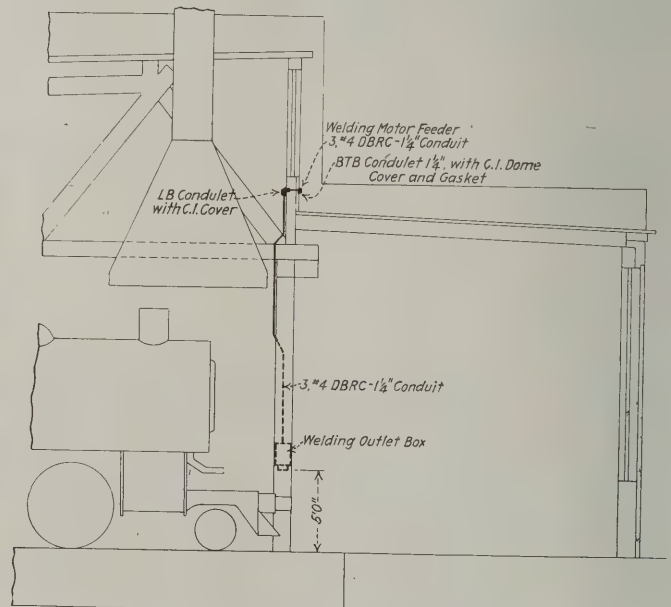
Sketch Showing Location of Welding Motor Circuit
